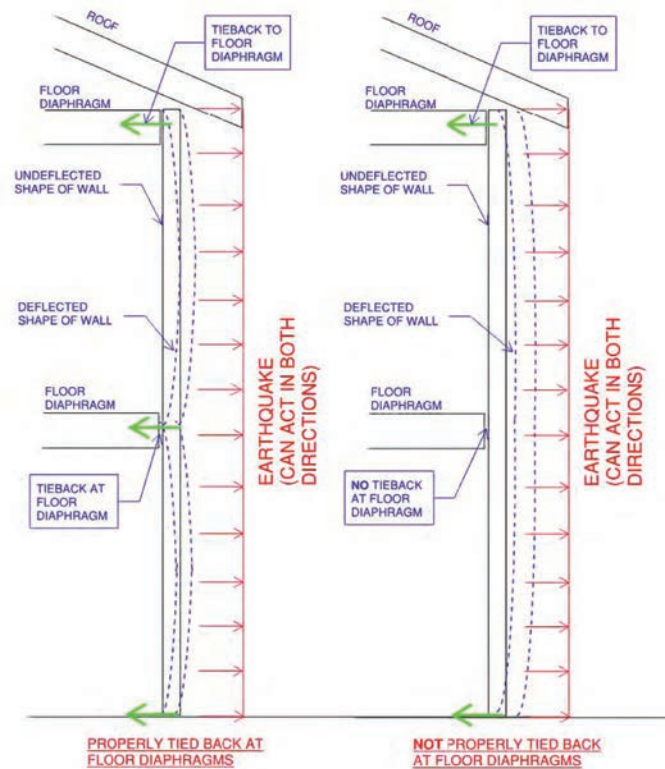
The diagram illustrates how floors need to be tied to exterior walls to reduce the amount of lateral deflection and therefore damage to the facades. There was extensive lateral cracking that occurred at the Homestead House because the second floors were not adequately connected. (Diagram by Thornton Tomasetti, Structural Engineers.)
